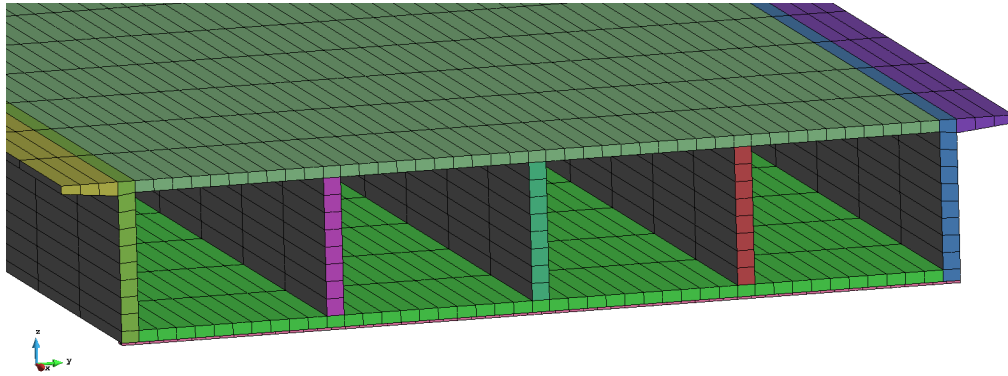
Mesh setting of the large box girder bridge (L210W10H8)
